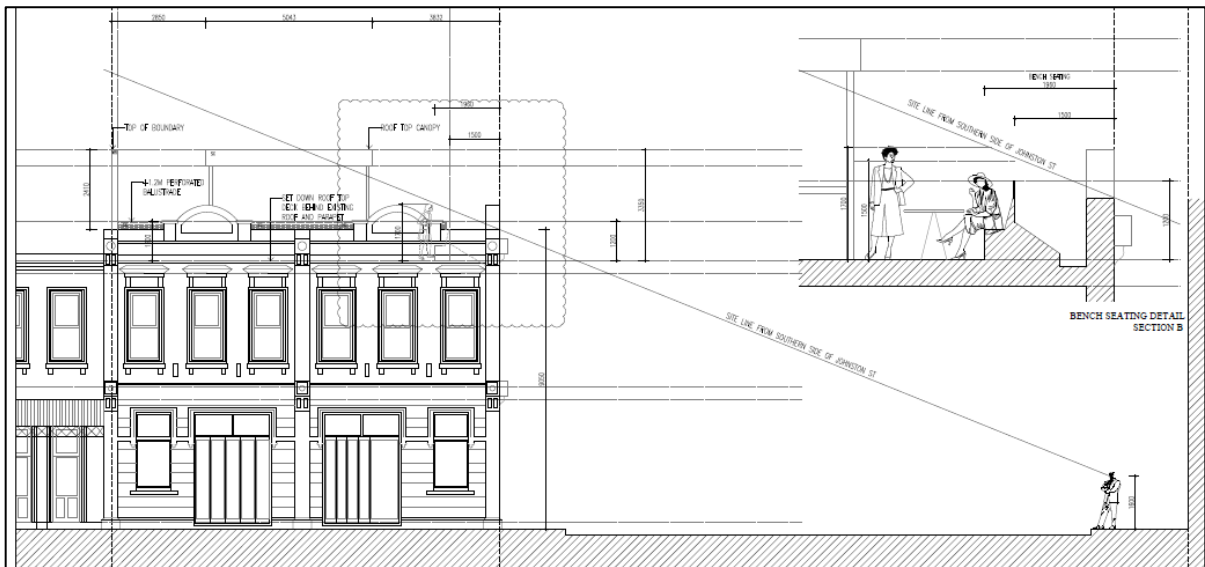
Sightline diagram from Johnston Street - Sketch plans (29 Sept 2020)
